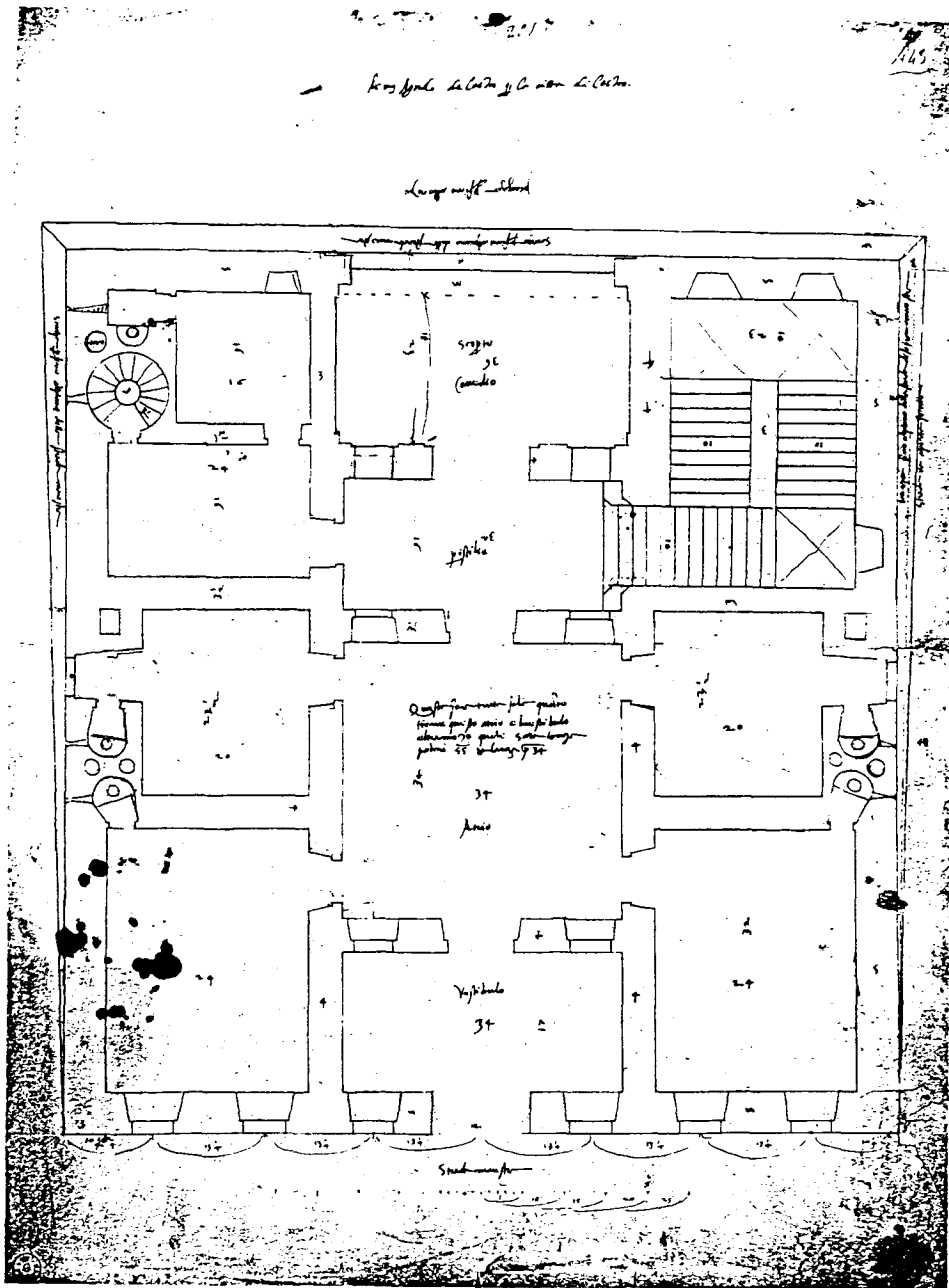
Antonio da Sangallo the Younger: plan for a house in Castro (Uffizi 747)
